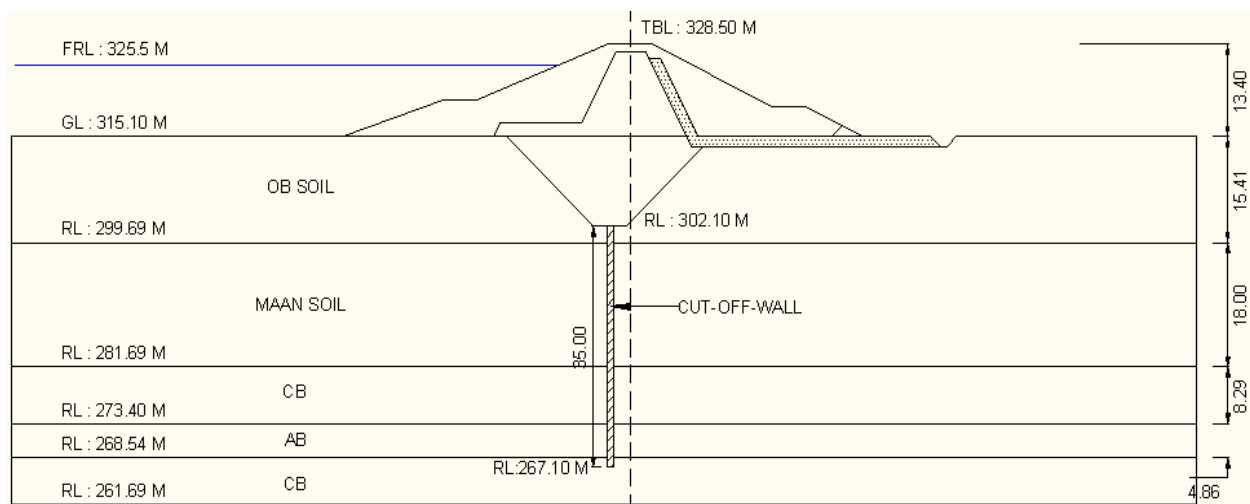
Dam cross-section with 35 m deep cut-off-wall below CoT
